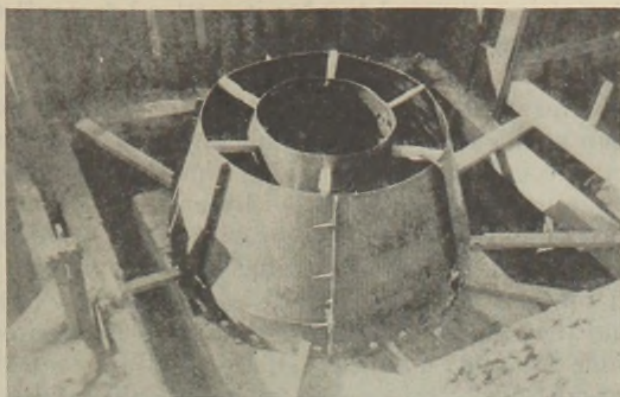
Sectional steel forms in place for pouring concrete manhole.
